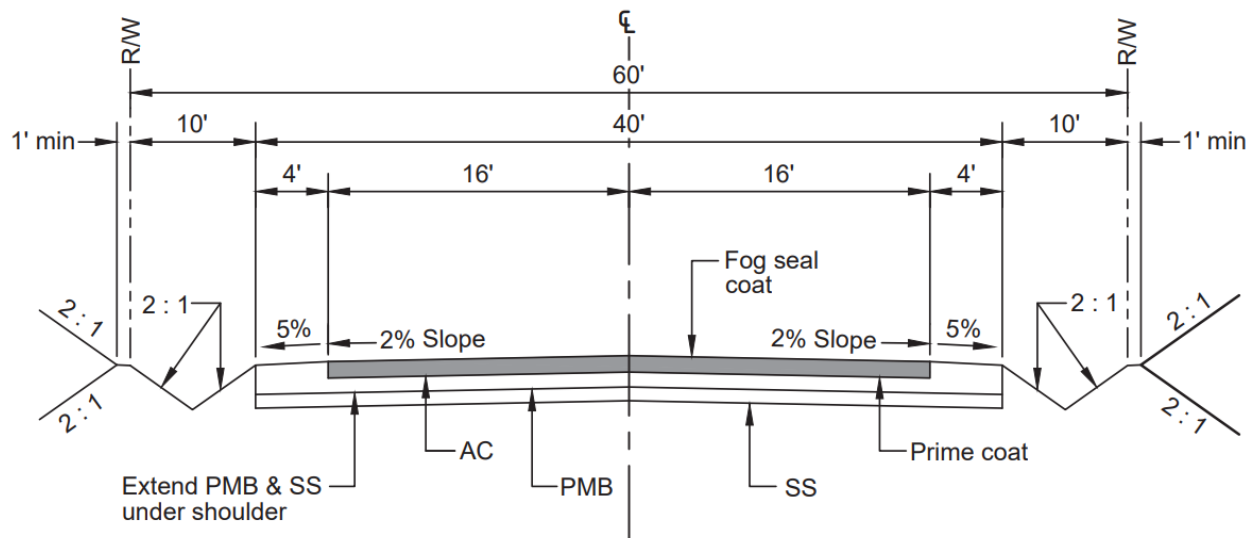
Plate B-7 cross section. R – Right of way width; W - Pavement width; F- Flooding free width.
